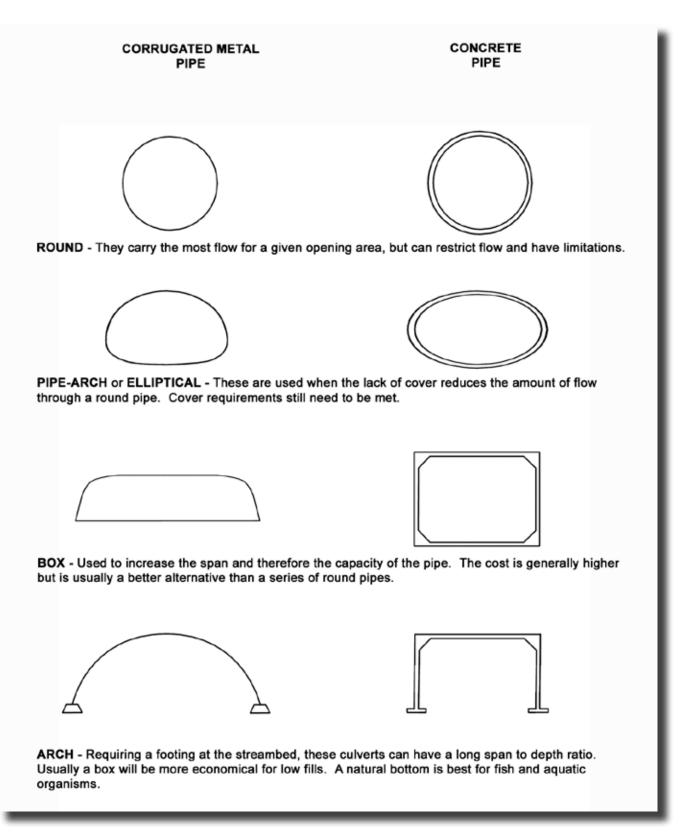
Examples of some typical culvert pipe types and shapes.
